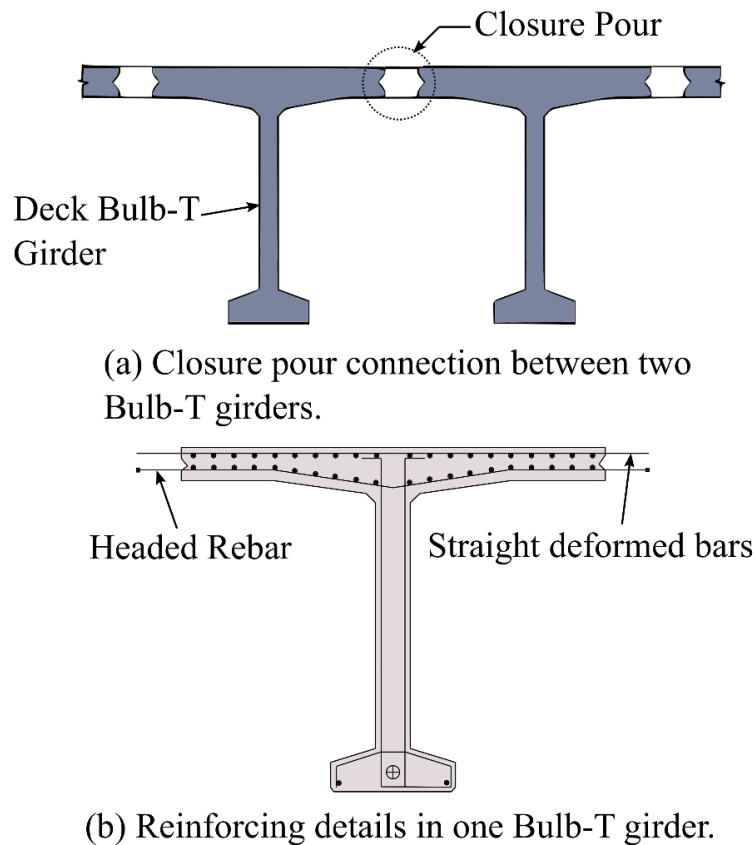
Example of closure pour between deck bulb-T girders with reinforcing details.
